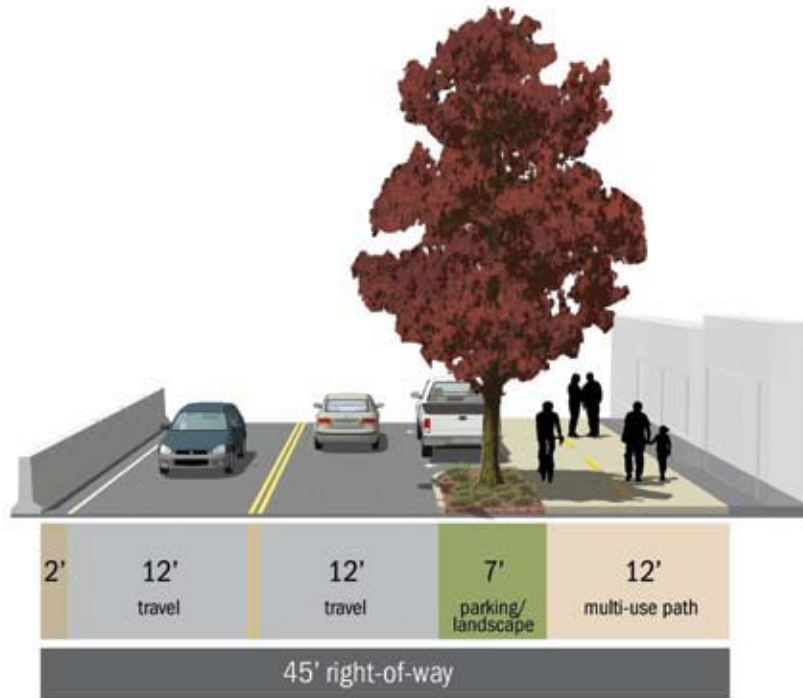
Conceptual Cross-Section for Main Street – Milport Road to Beta Street within existing right-of-way (looking north)
